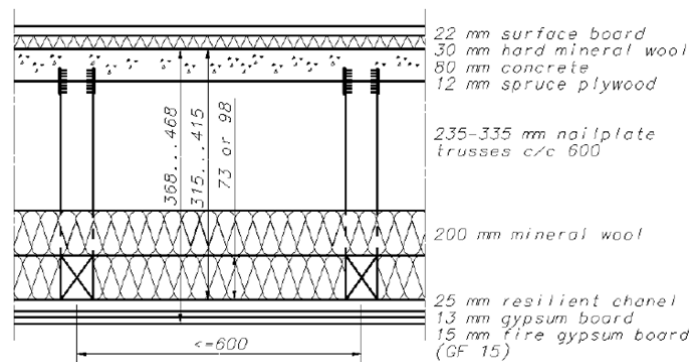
cross-section of the VTT wood-prefabricated concrete composite multi-storey house floor system
